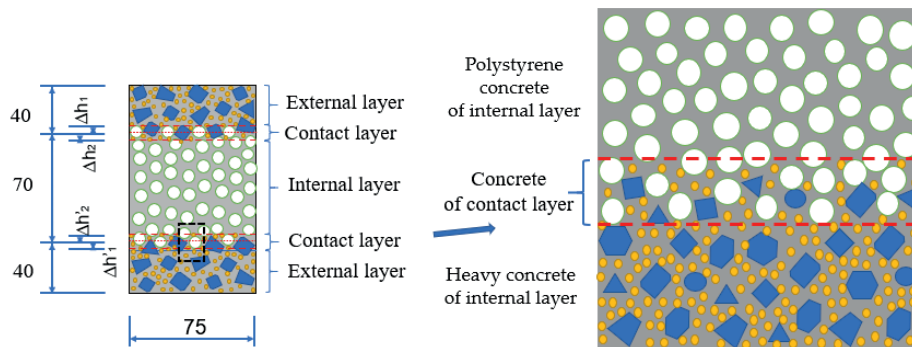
The contact zone of layers of multilayer reinforced concrete structures
